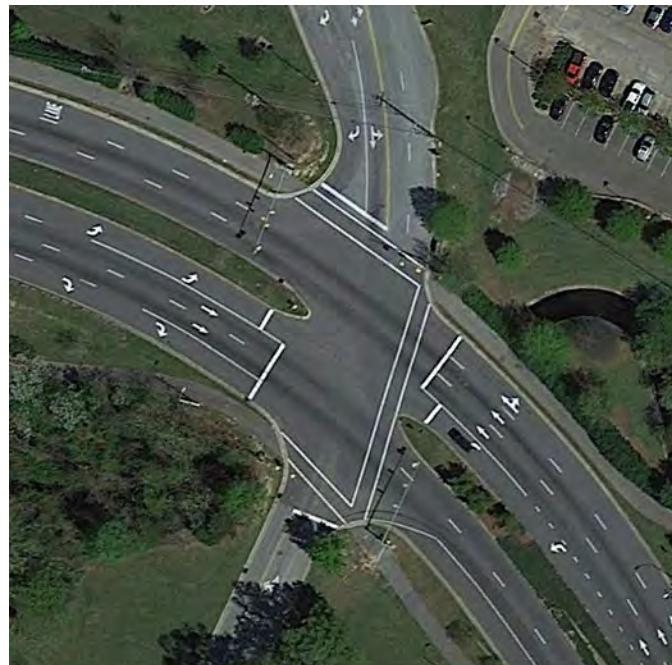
Design Flag 5 example. Out-of-direction travel for southbound crossing.
